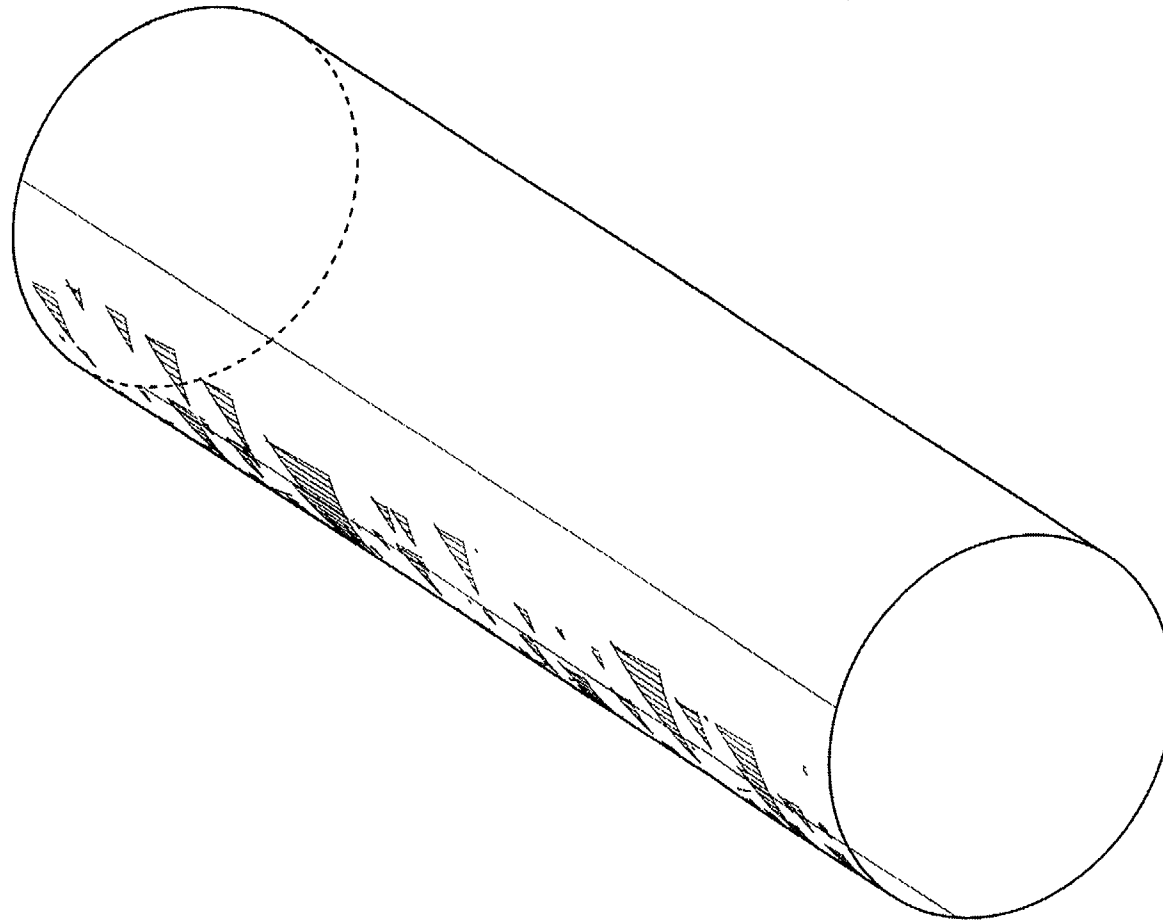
Traces of key blocks on emplacement surface for Topopah Spring Welded Tuff lower lithophysal unit
